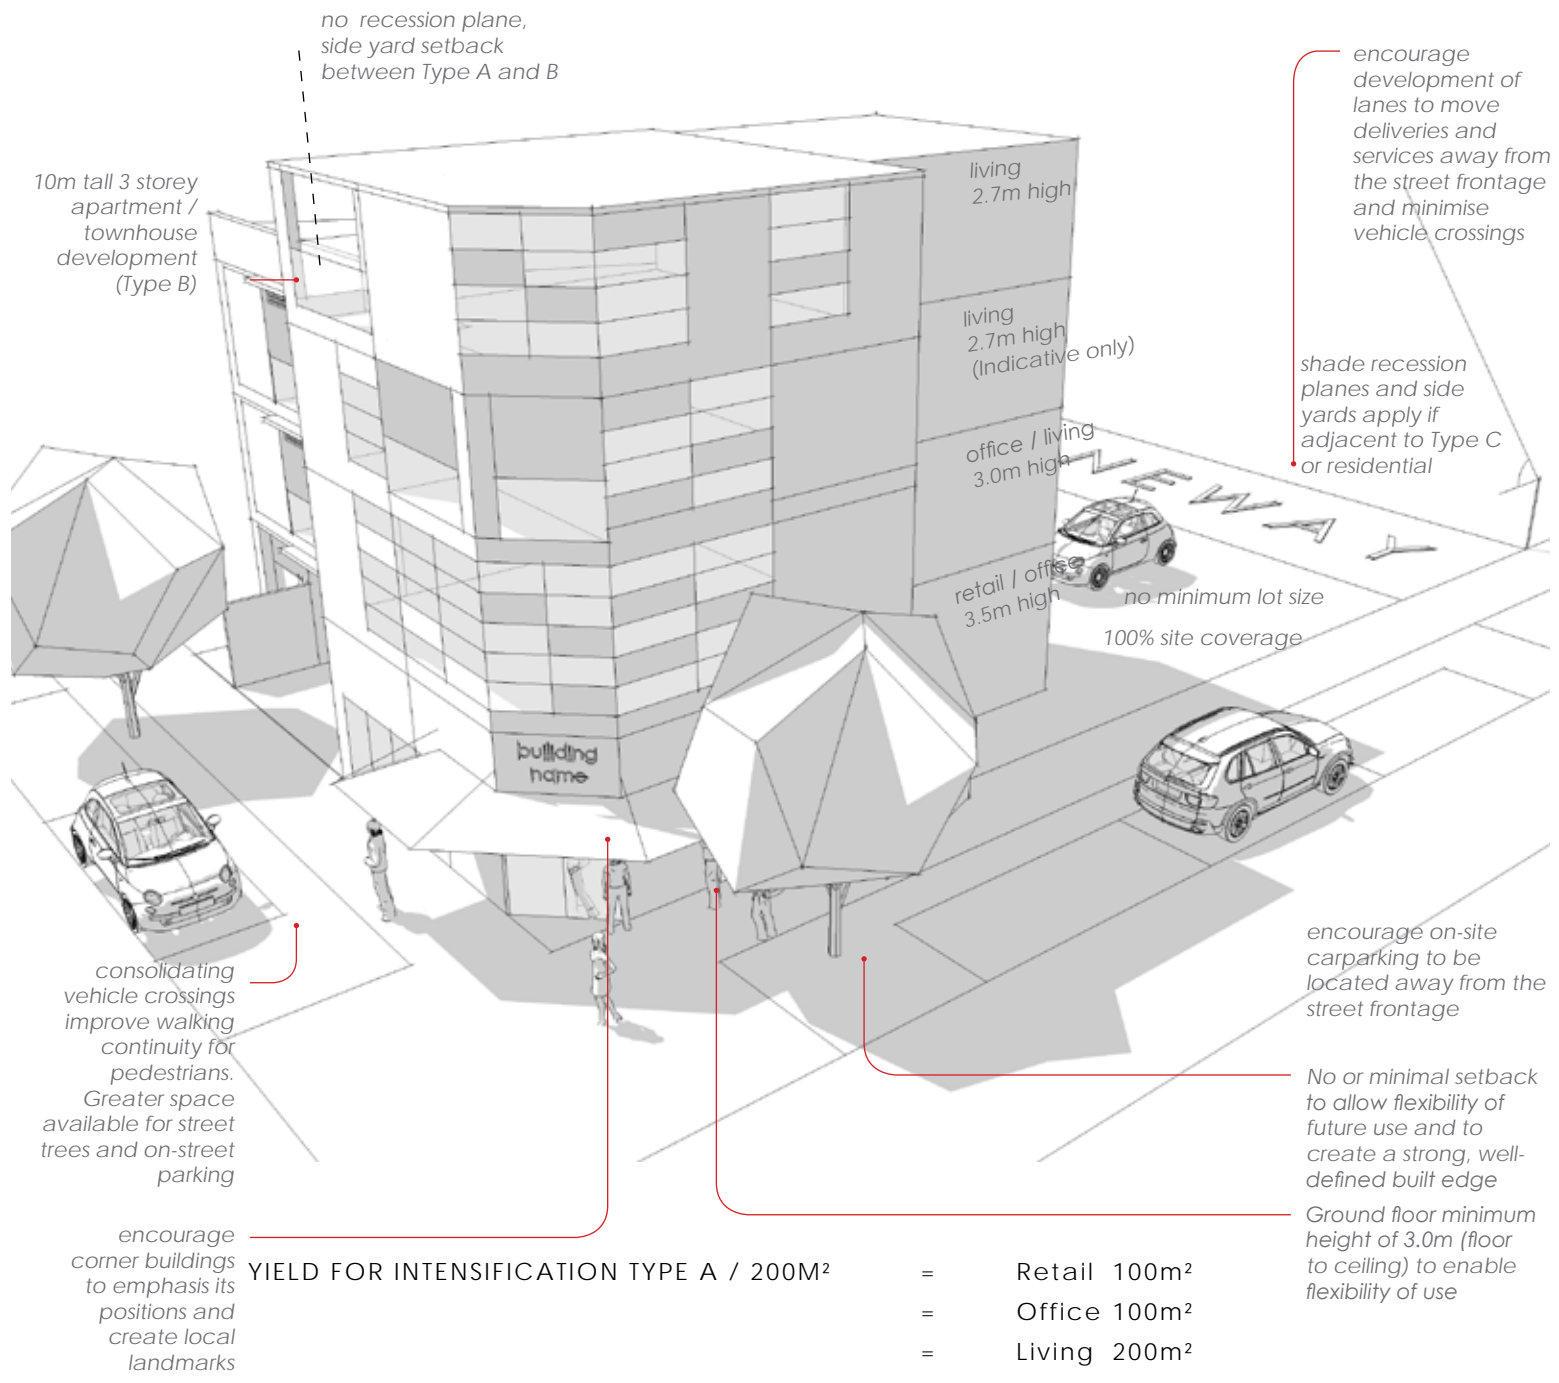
THE SKETCH ABOVE SHOWS A 12M HIGH, 4 STOREY MIXED USE BUILDING WHICH WOULD BE A PERMITTED ACTIVITY FOR TYPE A INTENSIFICATION
